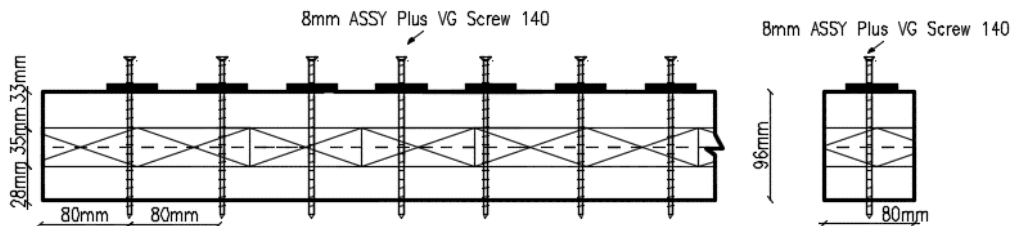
Series 2 layout: side section (left) and cross section (right)
